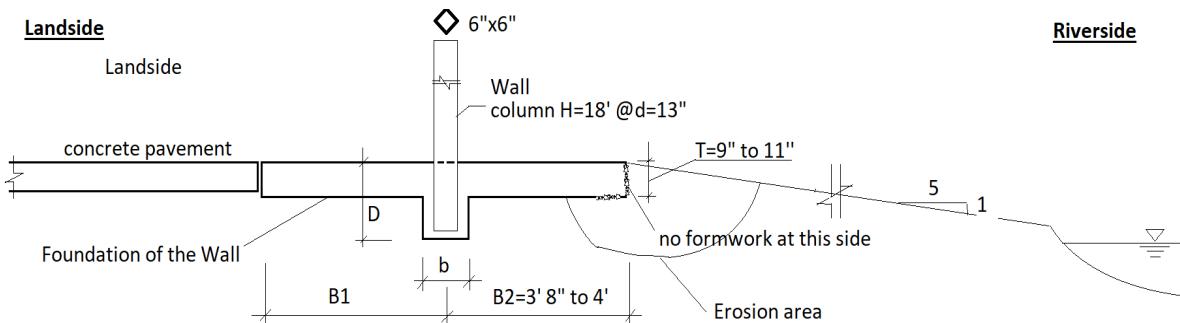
Typical Cross Section of the Fischer Bollard Wall
